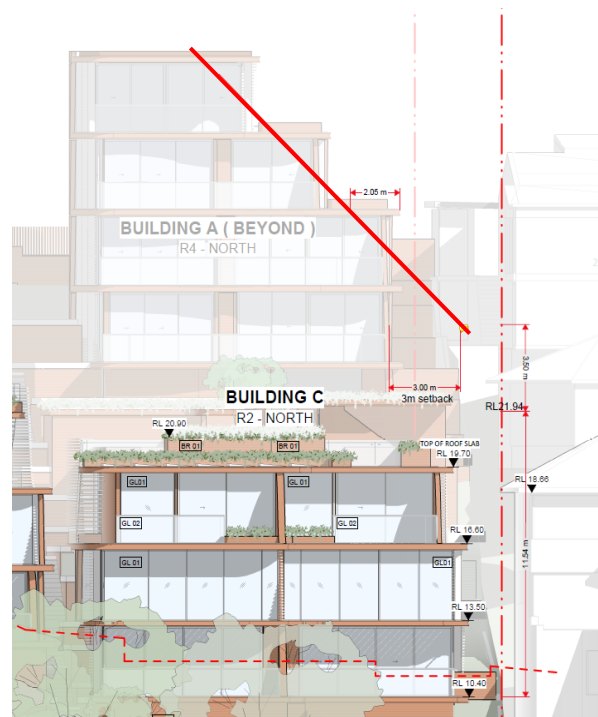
Side Setback Plane A101, with existing ground RL21.94 and 3.5m 45° incline plane, with 3m setback determined from envelope.
